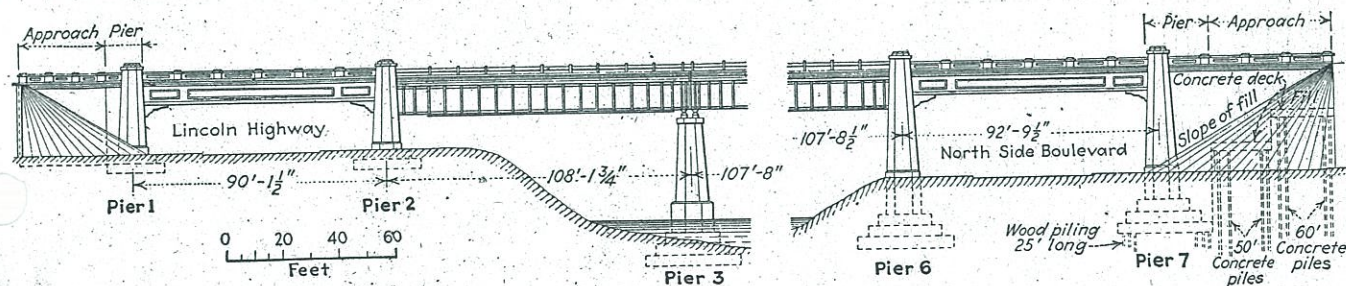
ST. JOSEPH RIVER BRIDGE, GRAND TRUNK WESTERN RAILWAY
